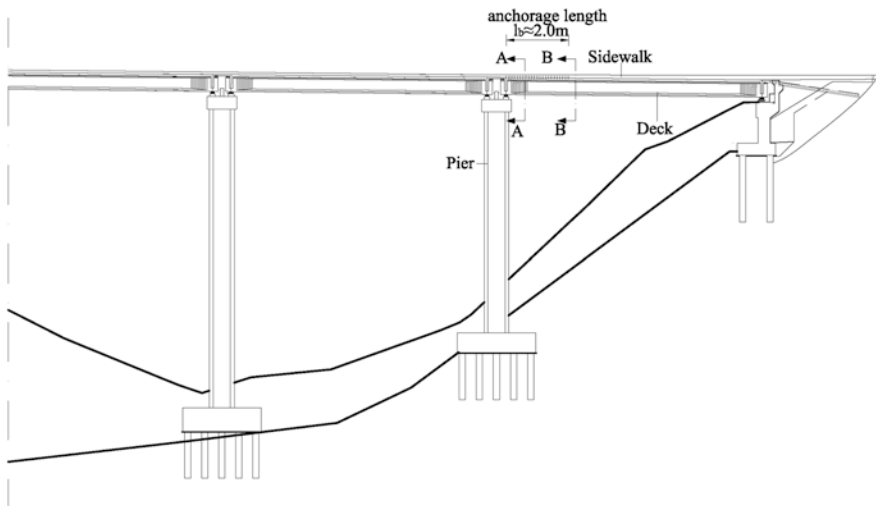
Longitudinal section of a precast I-beam bridge in which the proposed sidewalk-restrainers are implemented
